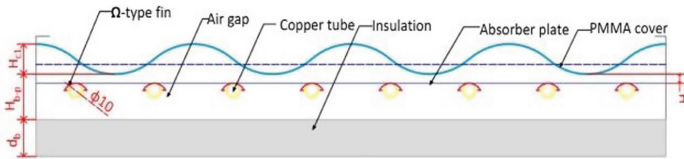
Cross-sectional view of wavelike roof solar collector [52].
